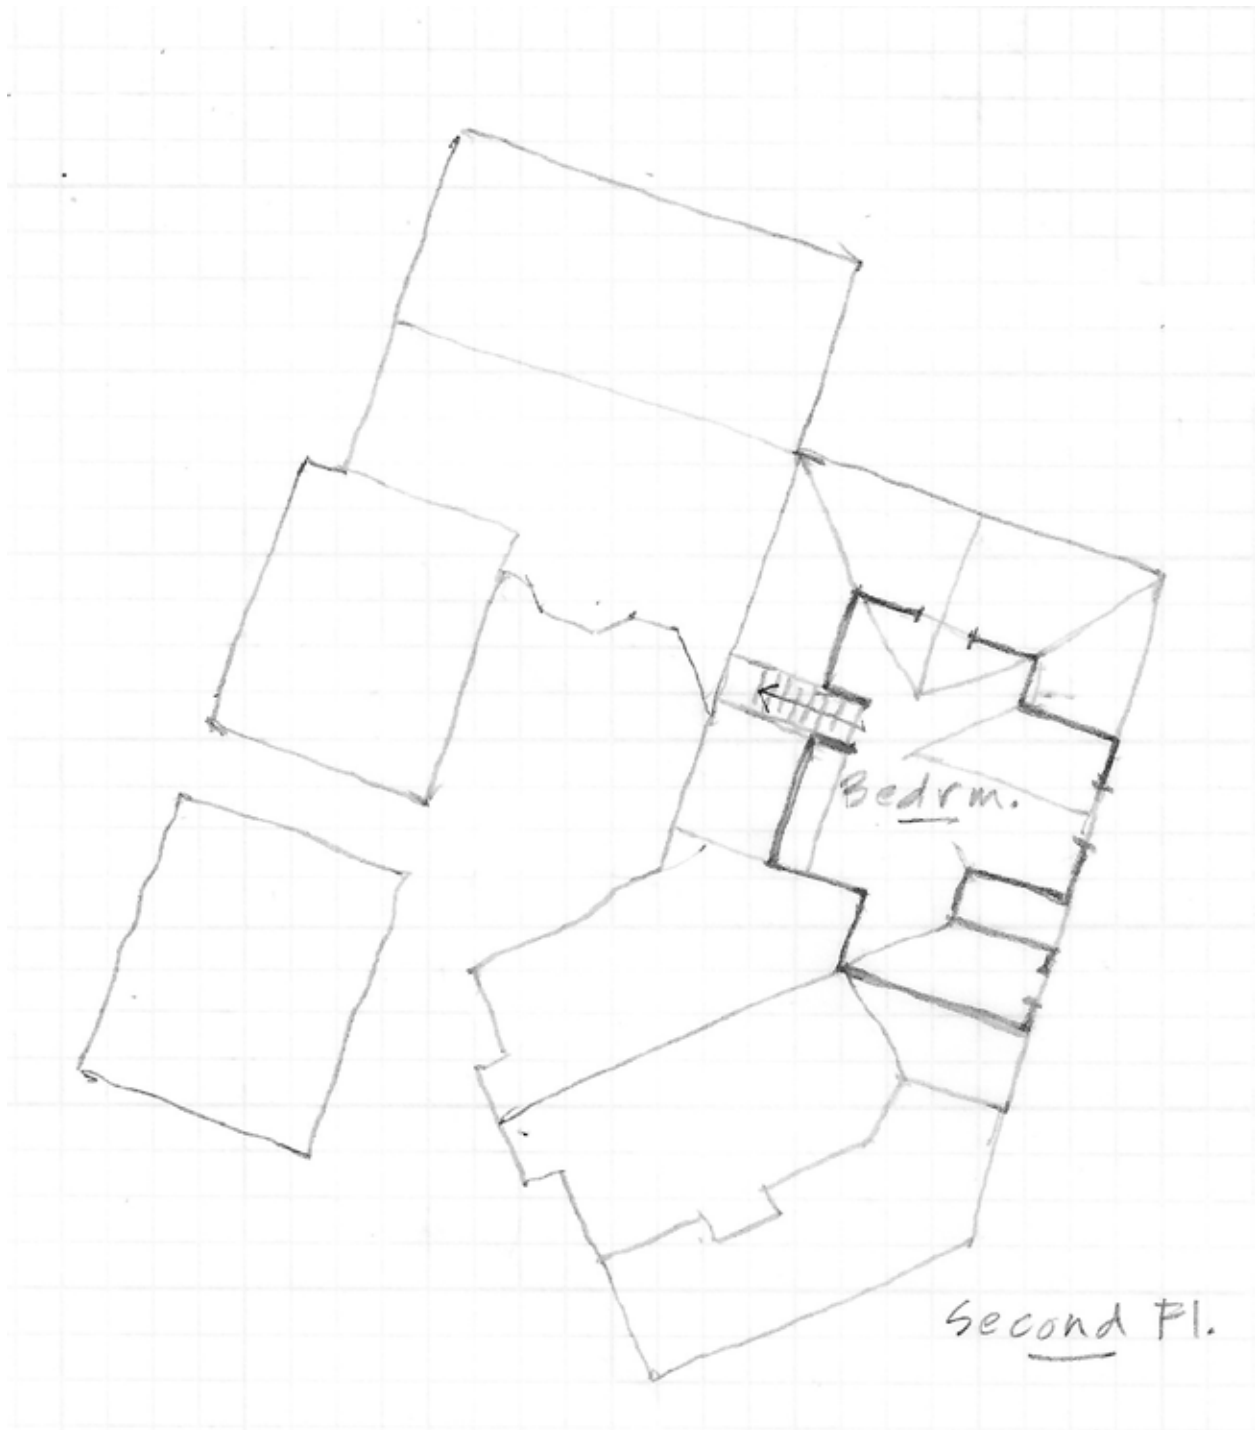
1850 Alameda Diablo – Second floor plan (south is up)
